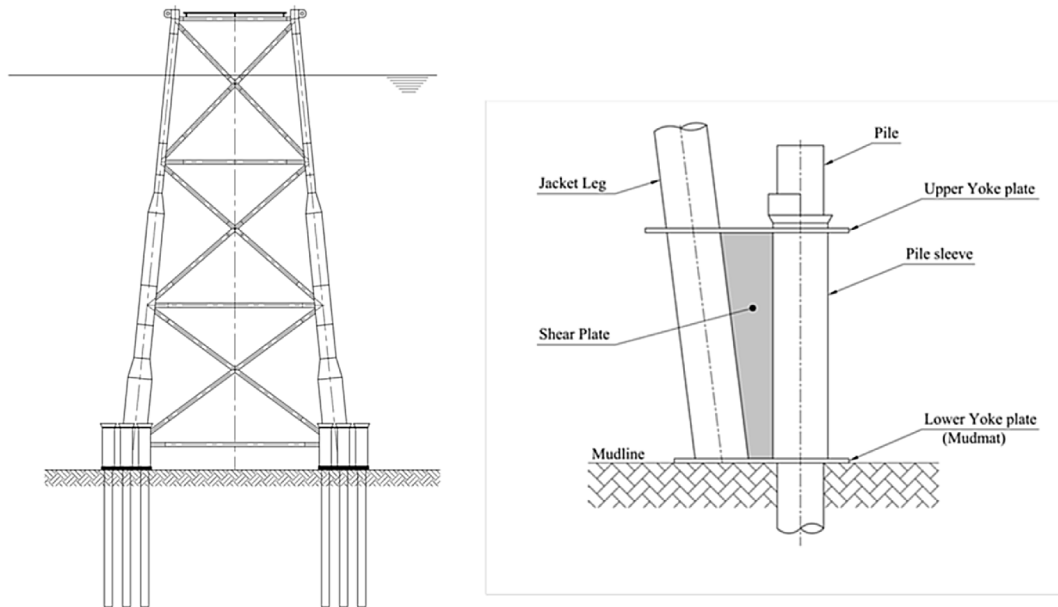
Typical jacket structure with pile sleeve connection detail.
